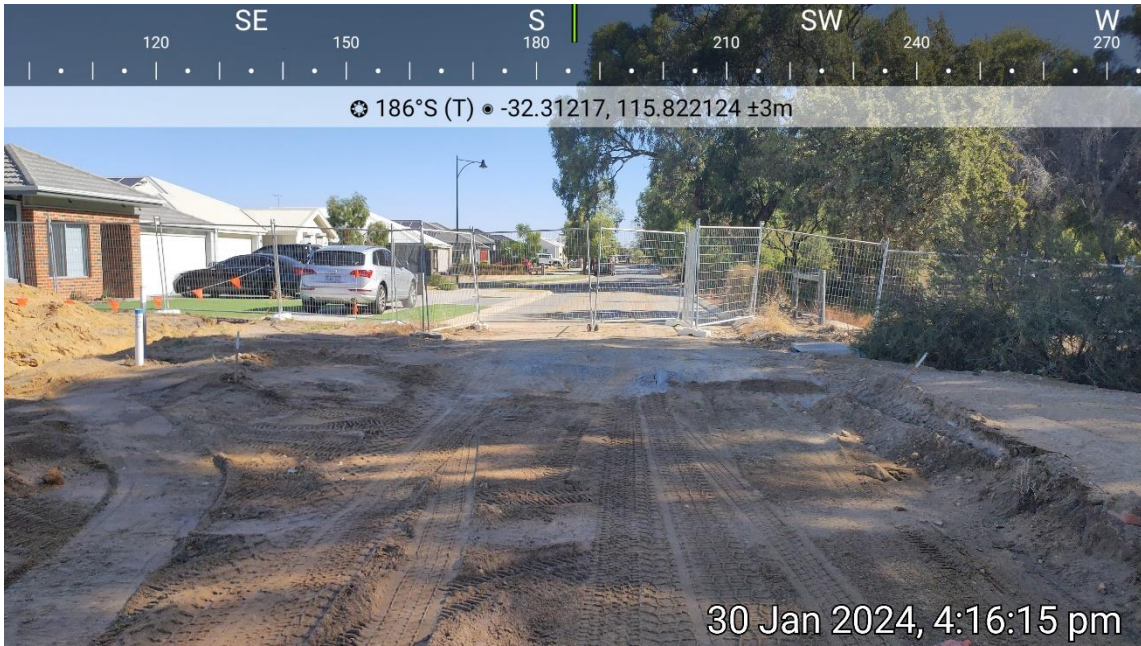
Evidence of construction internal road network and access/egress connection is underway.
